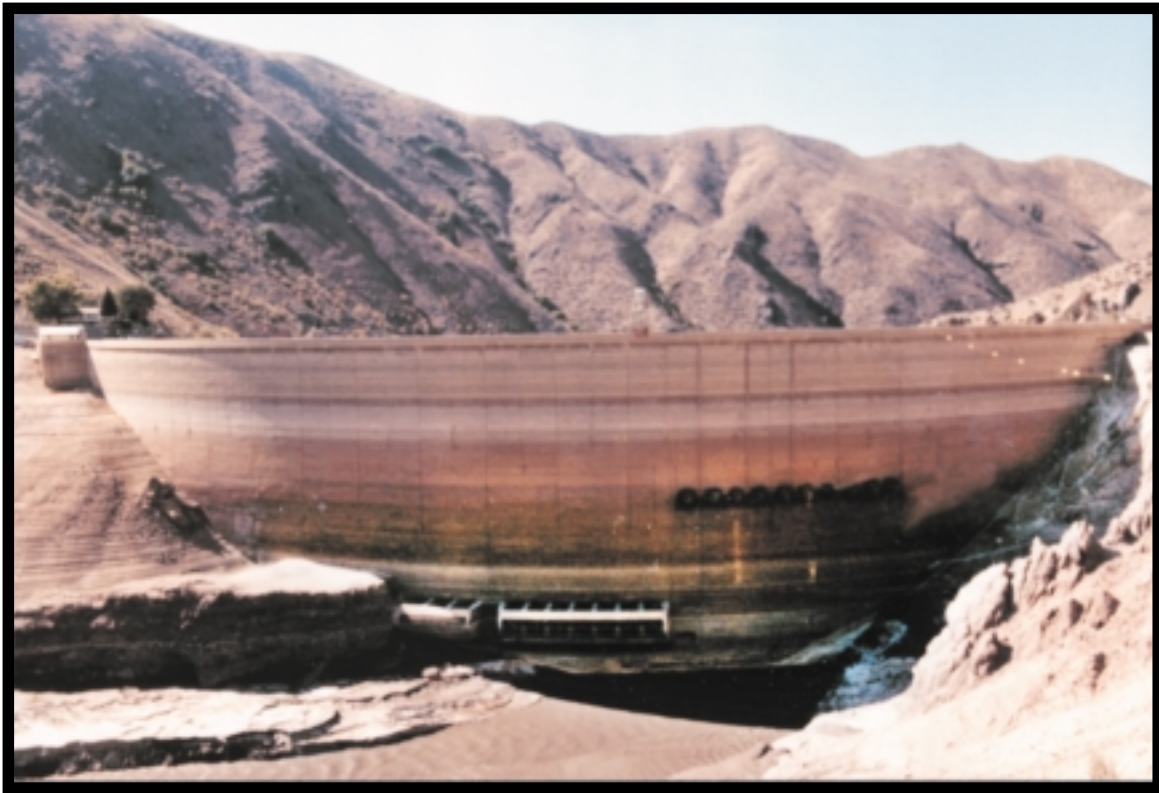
Looking downstream (west) at Arrowrock Dam from the north bank of the main stem Boise River. The estimated elevation of Arrowrock Reservoir is about 2985 feet (Oct. 1987)
